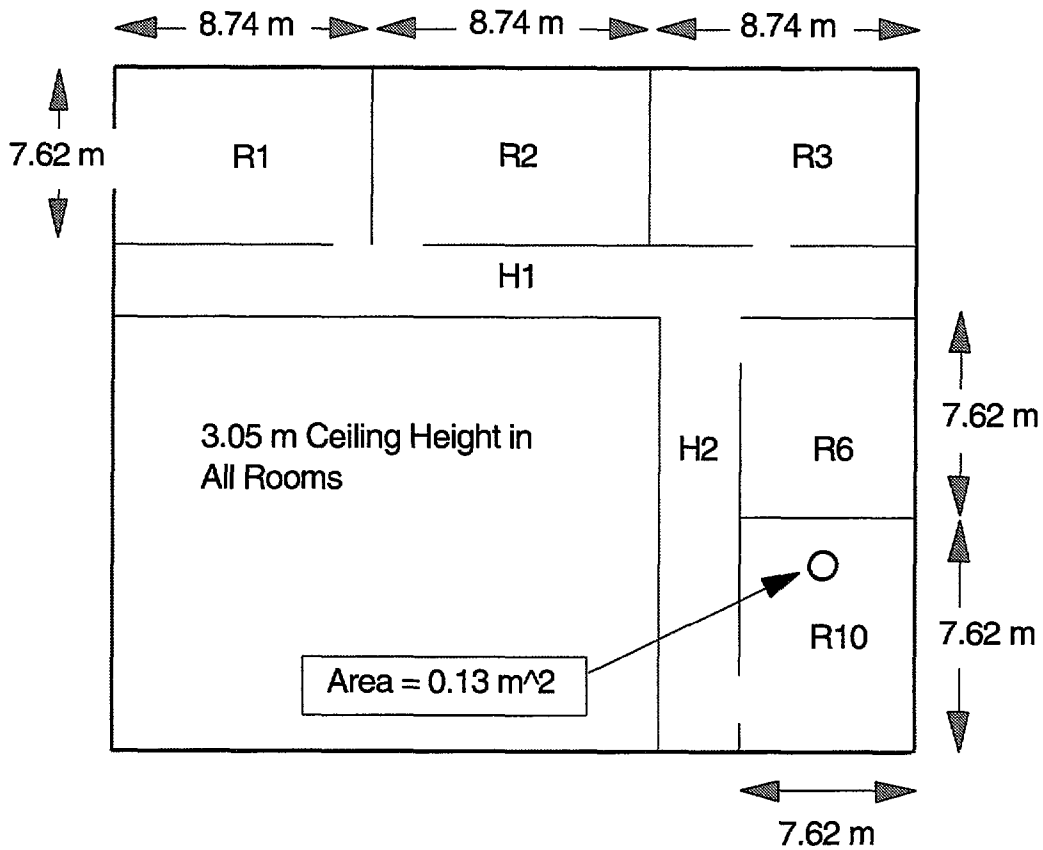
Floor plan of the underground facility. All dimensions are in meters. The height of the rooms is 3.05 m (10 ft). The walls appear to have negligible width but in reality are 0.46 m thick between rooms and 0.76 m thick at exterior walls. Below Rooms R6 and R10 are similarly sized rooms connected via a stairway in hallway H2. Room R10 and the two downstairs rooms are all connected, and vented to the atmosphere through a vertical vent approximately 35 cm in diameter. It is assumed that this is the only ventilation from the enclosure to the atmosphere. The area in the lower left hand side of the figure is sealed off and assumed to play no part in the scenario outlined here.
